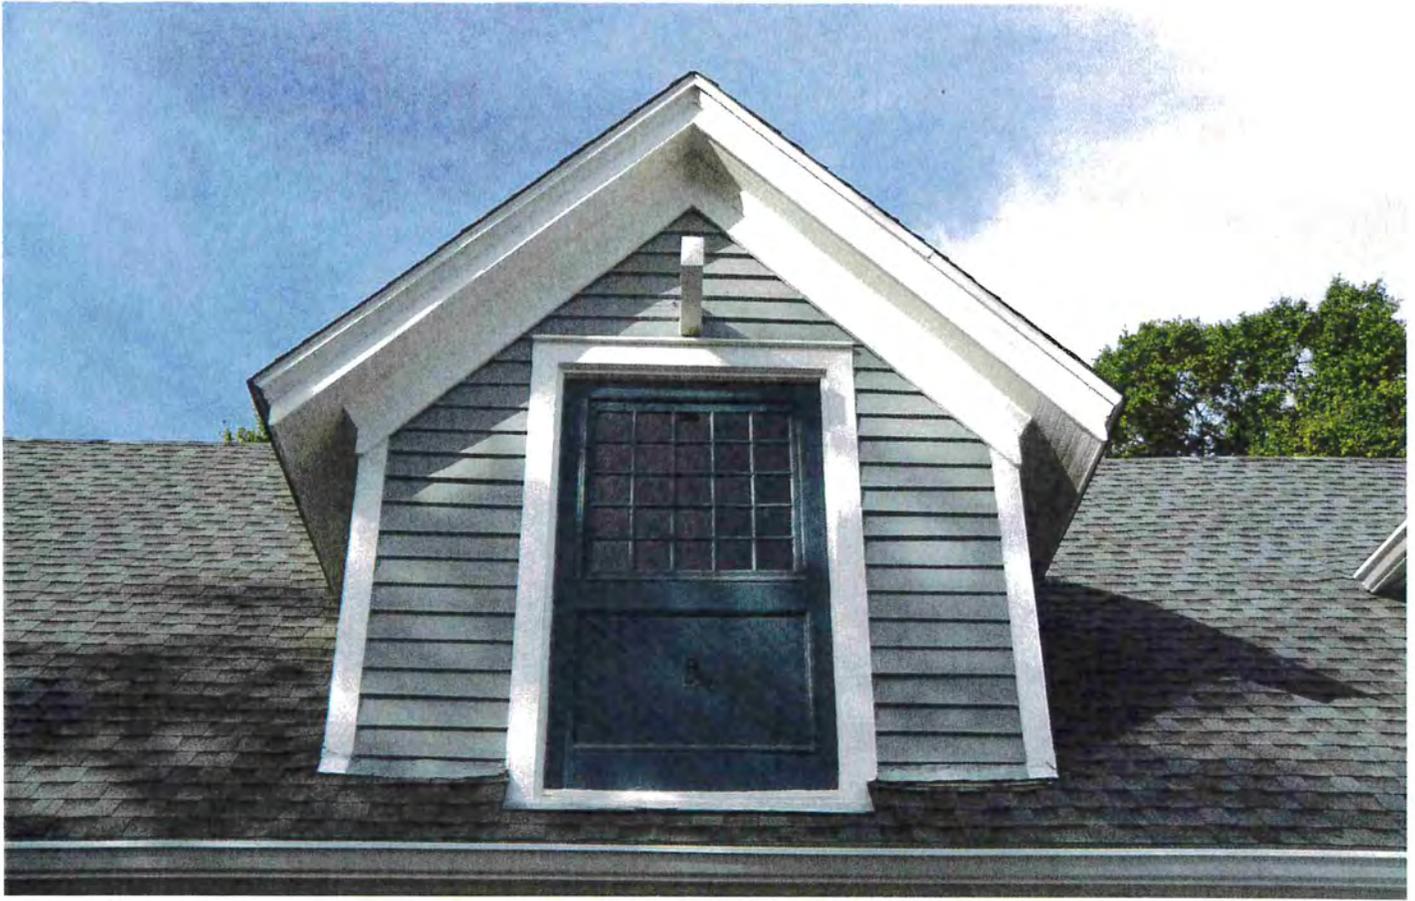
Restored dormer above entry on east façade. 10/28/16
